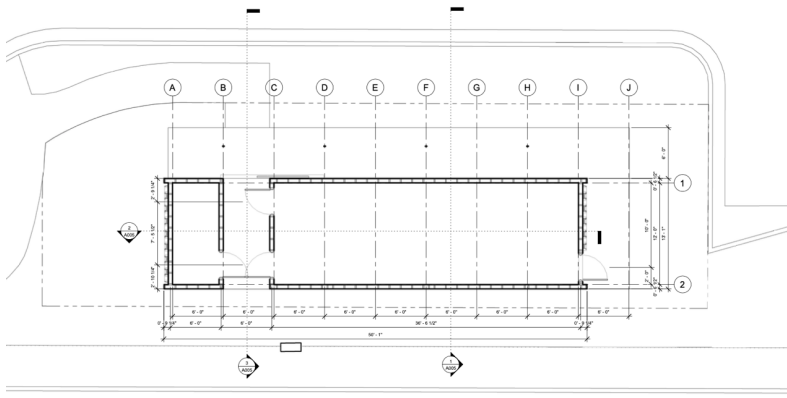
Ground Floor Plan: KSU Mini Pavilion with Dimensioned Structural Grid (Michael Carroll 2022)
